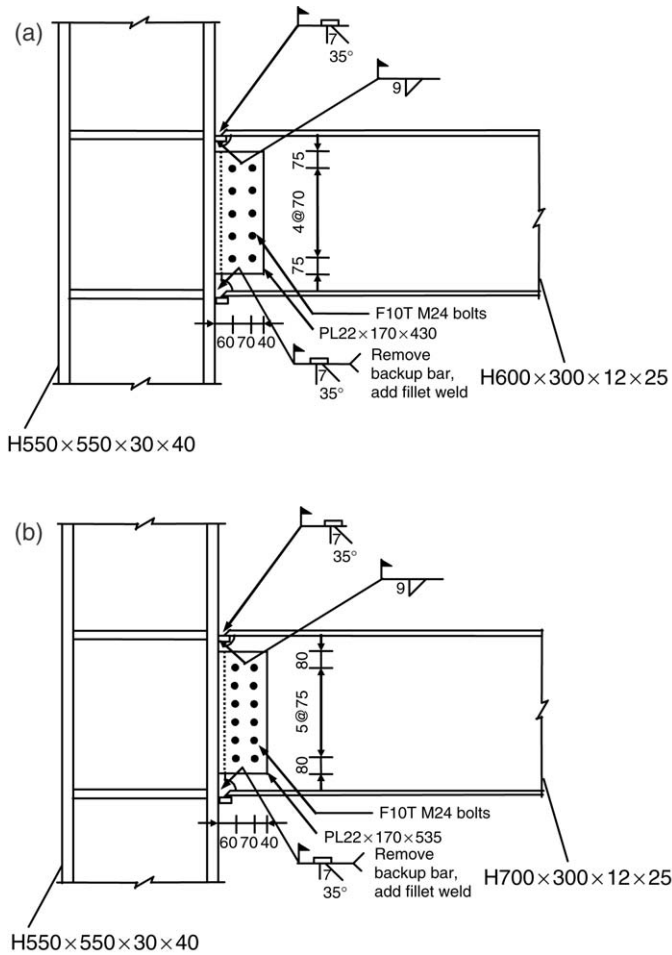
Connection details for two unreinforced connection specimens: (a) specimen S6; (b) specimen S7.
